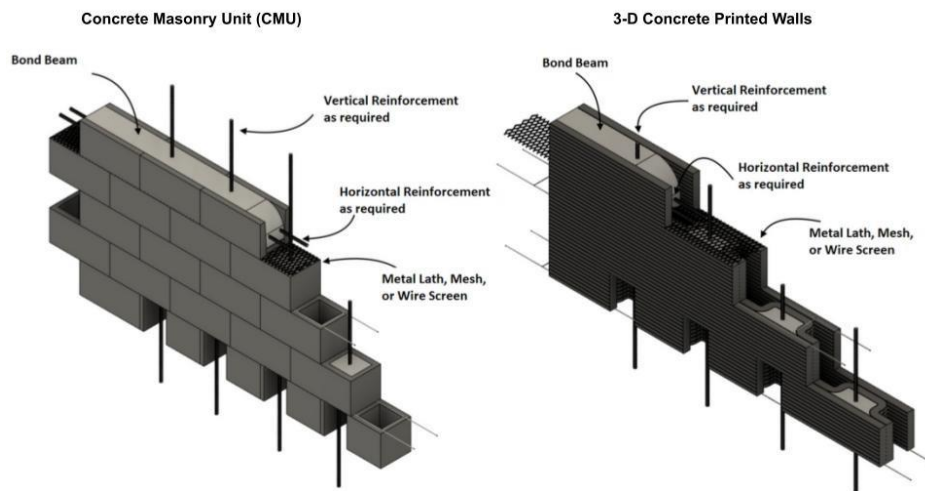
Comparison between traditional CMU and 3D concrete printed walls [6]
